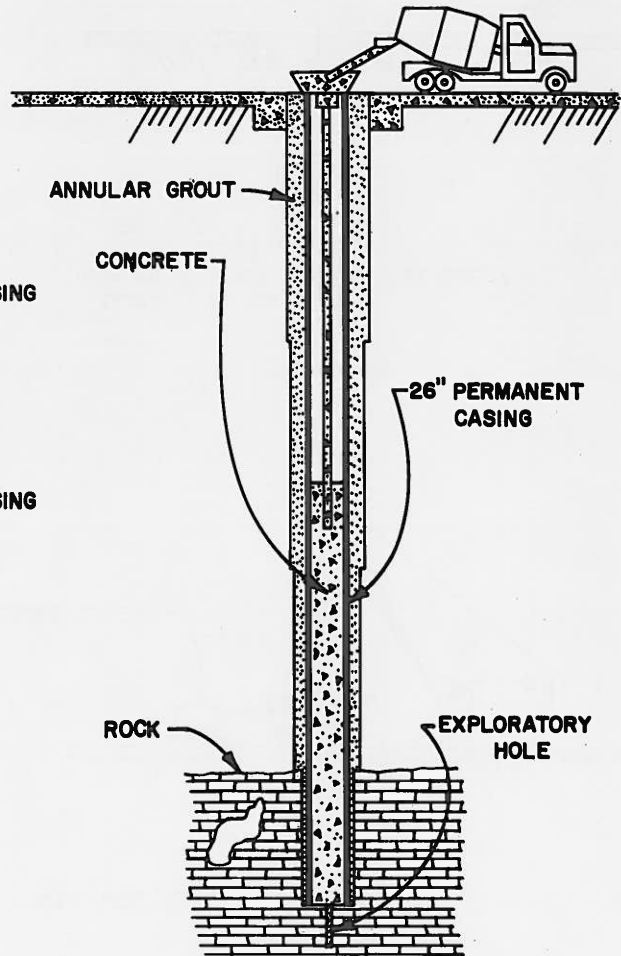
THE 26-INCH DIAMETER PERMANENT CASING IS INSTALLED AND TREMIE CONCRETE PLACED. TO COMPLETE A PRIMARY ELEMENT.
